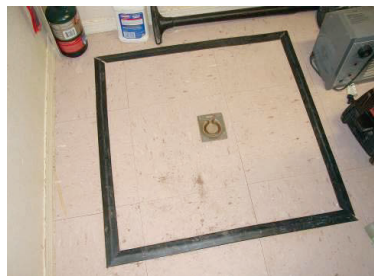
Crawl space access hatch; weatherstripped and easily removable
